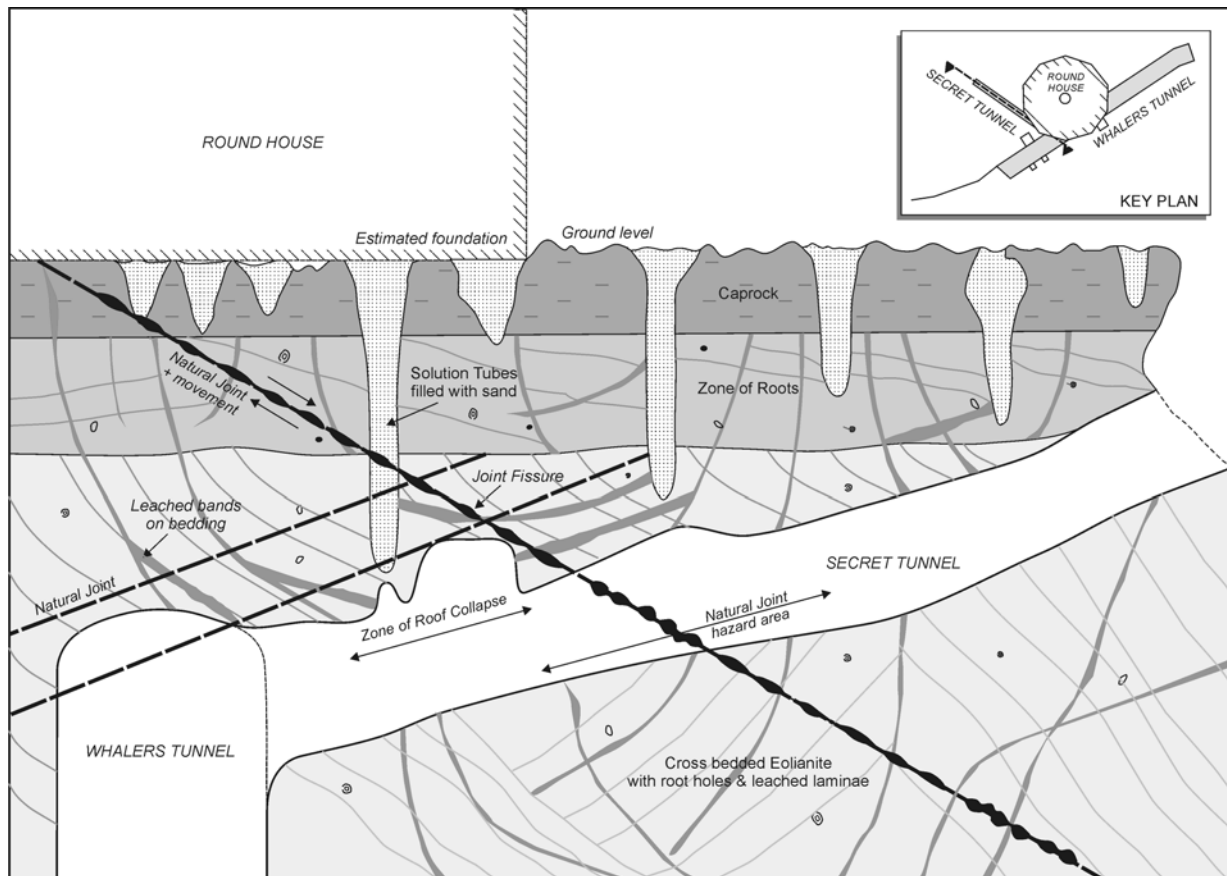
Arthur Head - Long Section through Secret Tunnel.
